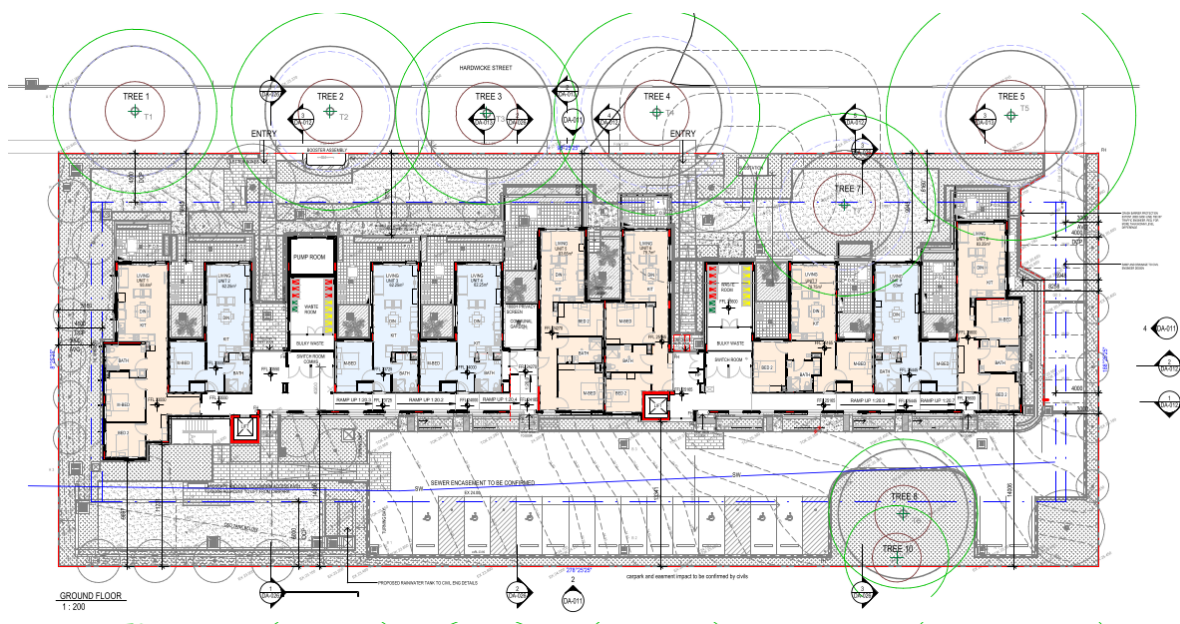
Extract from Architectural Plans – Ground Level (Source: Architectural Plans, Custance Architects, dated 19/09/2024)
